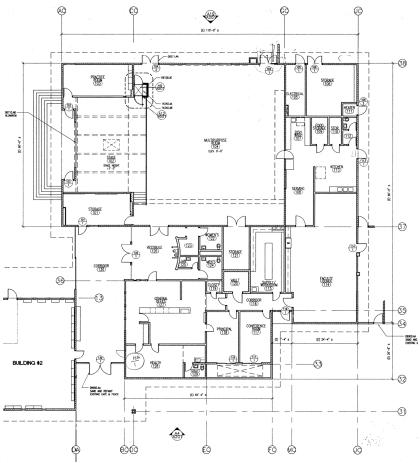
BUILDING 1: 1998 Modernization 1st Floor Plan
